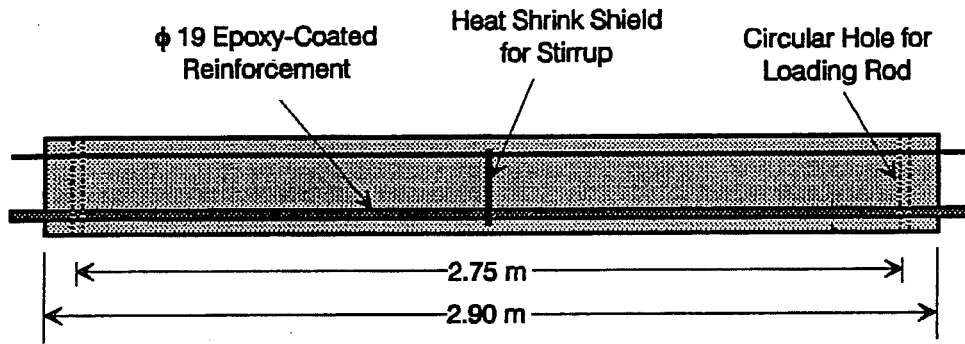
Details of Group I-Beam Specimen (Longitudinal Steel) [Kahhaleh, 1994].
